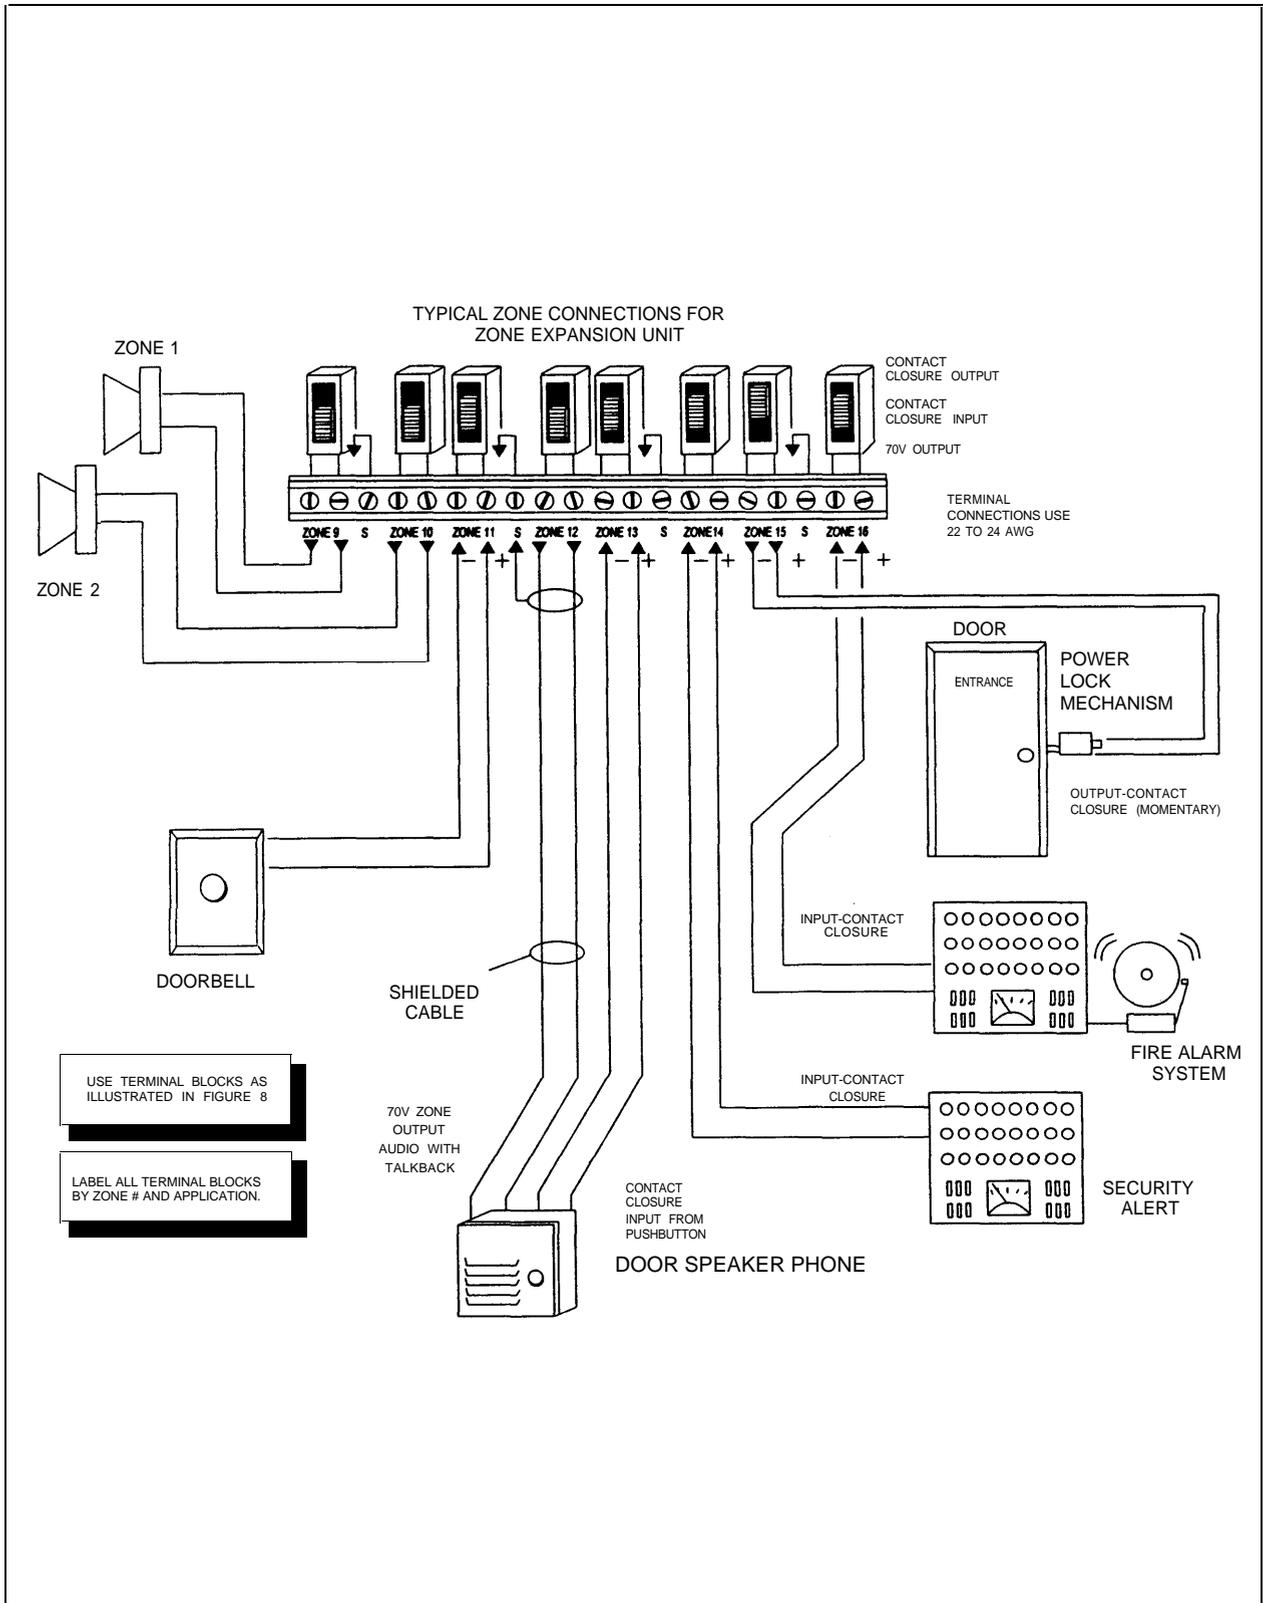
Contact Closure Zone Wiring to Zone Expansion Units and Controller
